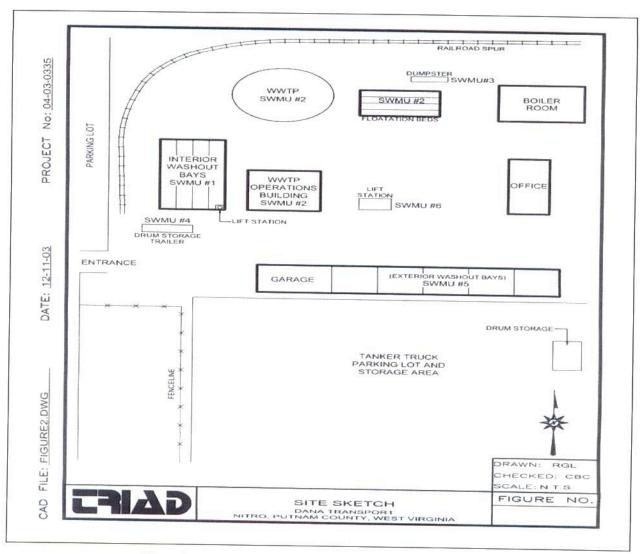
Site Sketch (Preliminary Assessment April 29, 1990)
